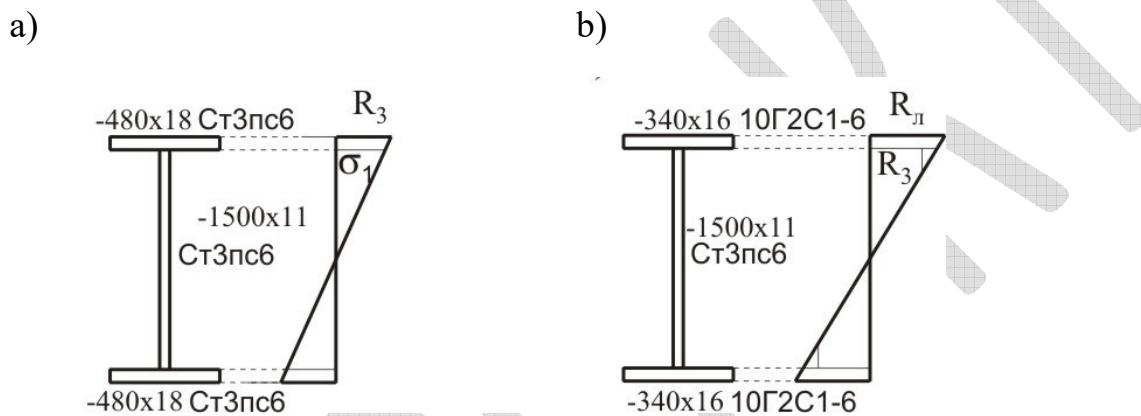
To calculate the main beam: a) monometallic, b) bimetallic
